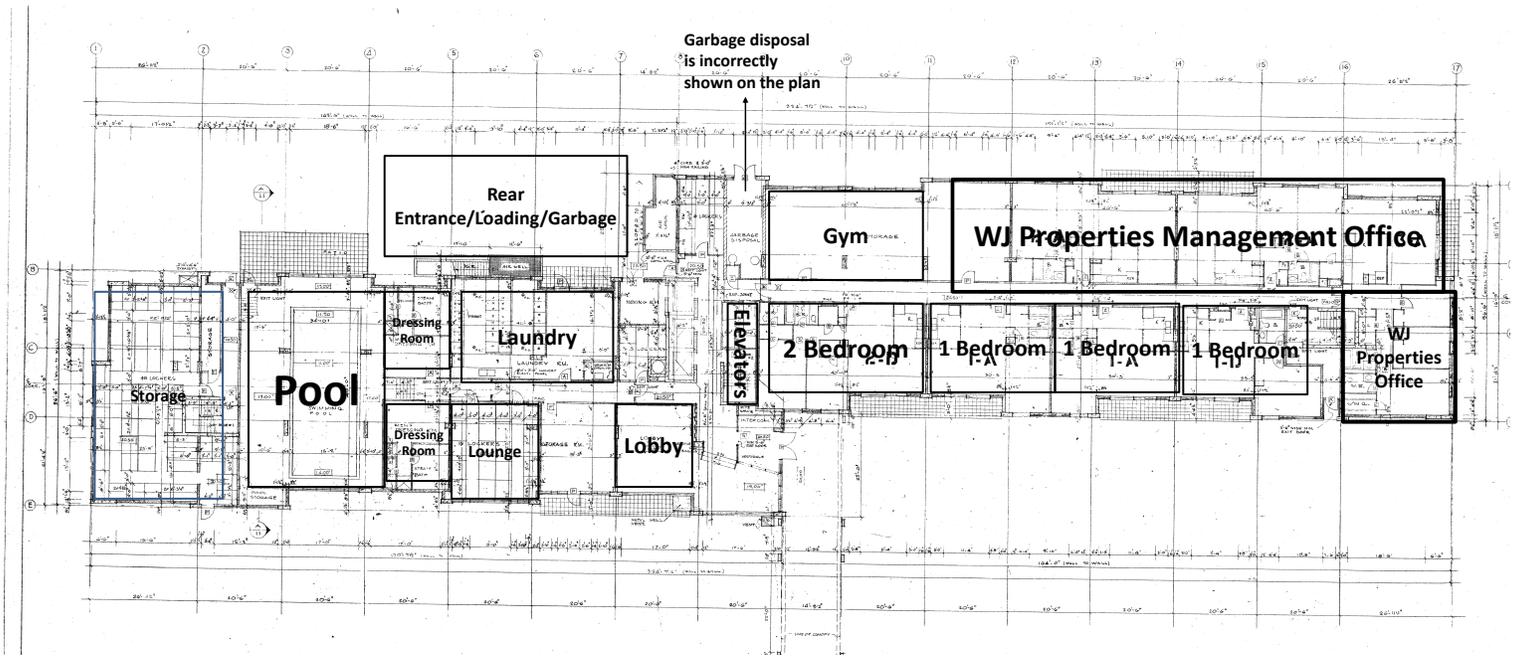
Ground Floor Plan - 7 St. Dennis Dr
